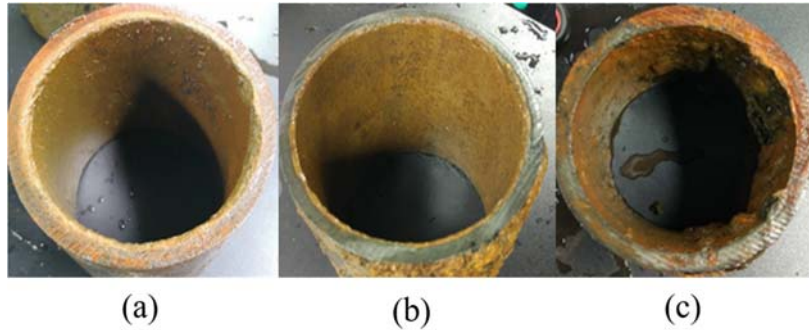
Appearance of three pipe sections internal surfaces (a: pipe A; b: pipe B; c: pipe C)
